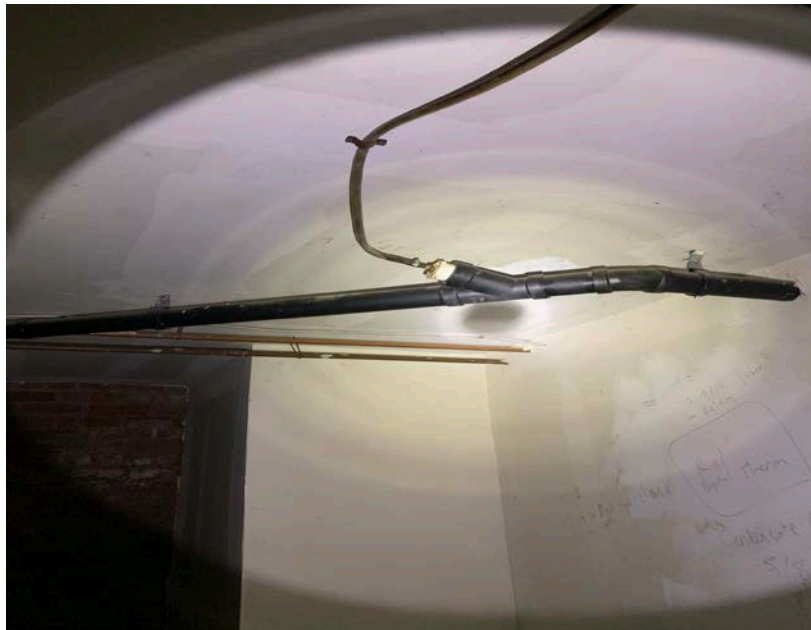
View of Basement Sump Pump and Connection to Sanitary Sewer in 172 Main Street Basement
